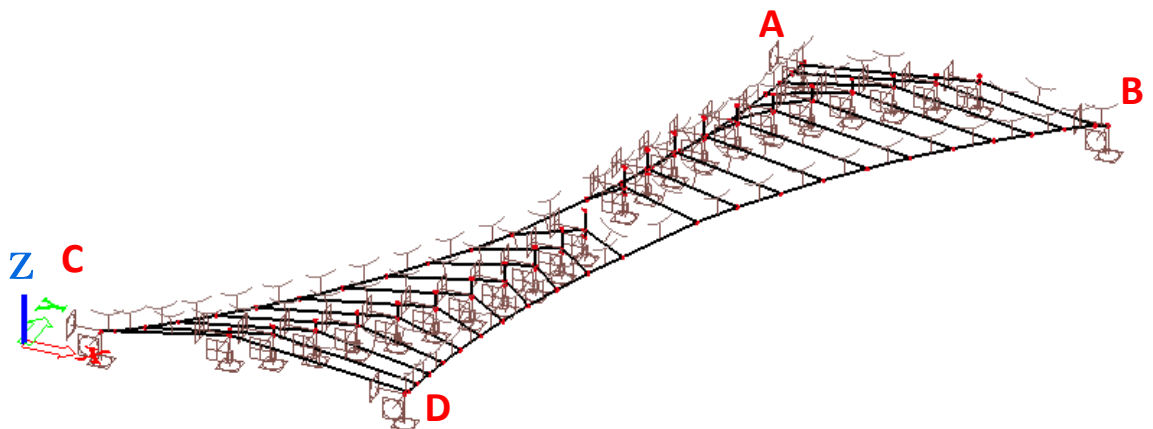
ANCHORING SYSTEM MODELED IN SCIA ENGINEER
